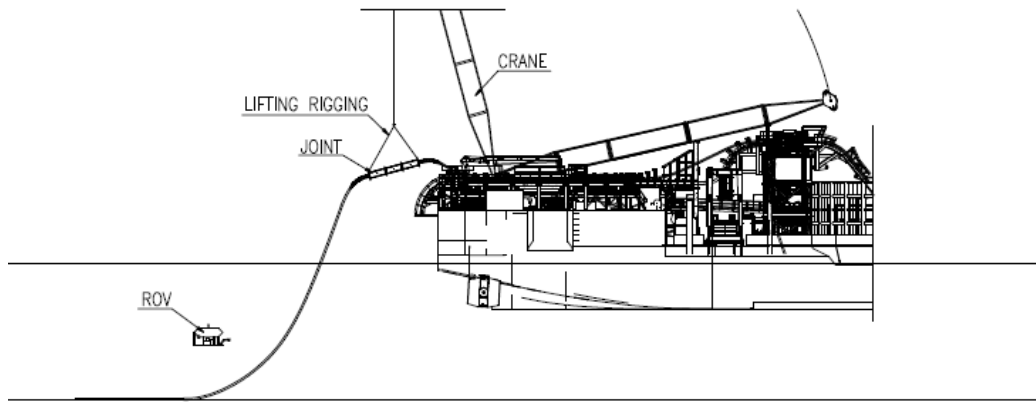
Lift the joint outboard. Tensioner to pay out cable to ensure sufficient slack during operation.
